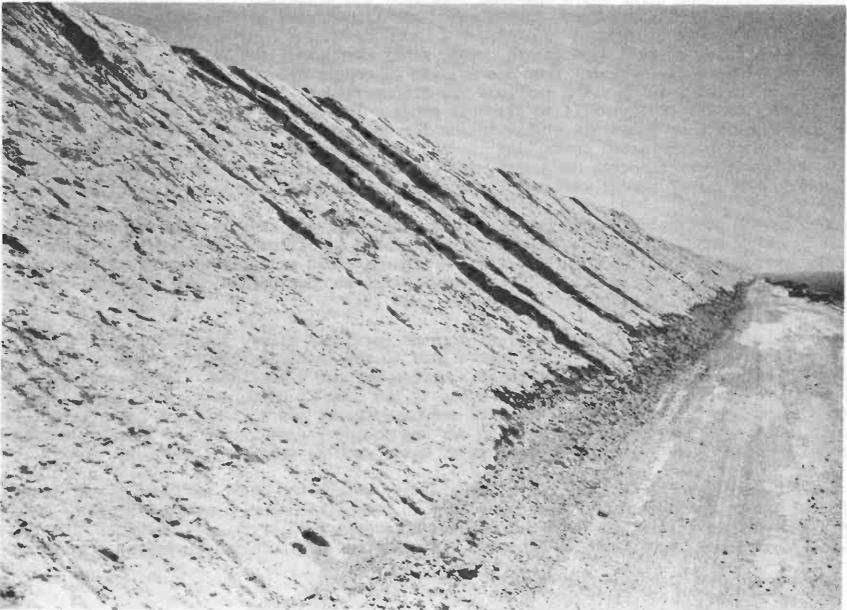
Tailing pond slope seeded without the use of sewage effluent -- poor germination, and severe erosion due to wind and water reducing seeding emergence.
